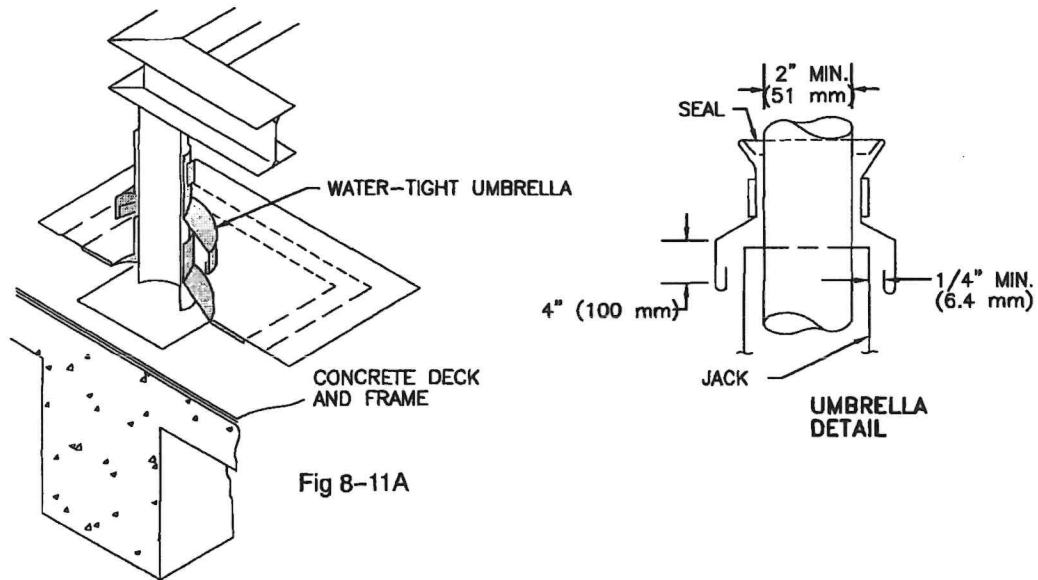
EQUIPMENT SUPPORT FLASHING
